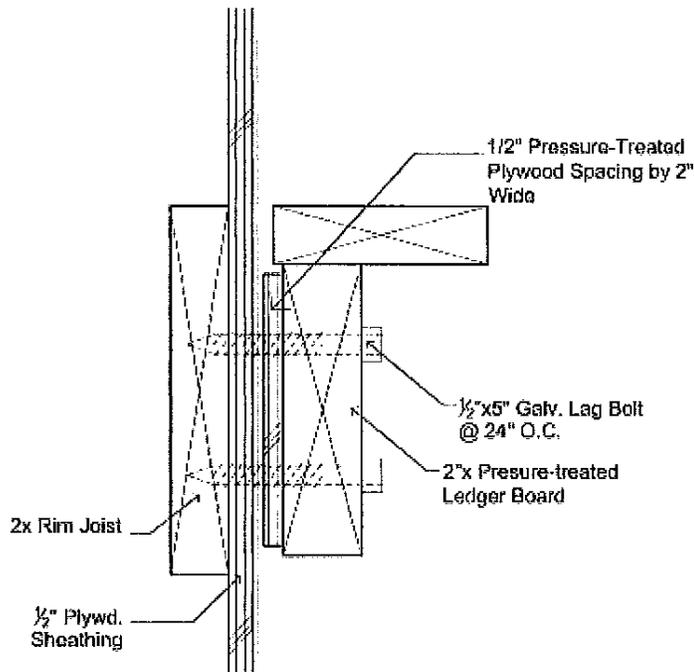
Alternate Connection Detail: 1/2" PT Plywood and 1/2" Drainage Spacers
